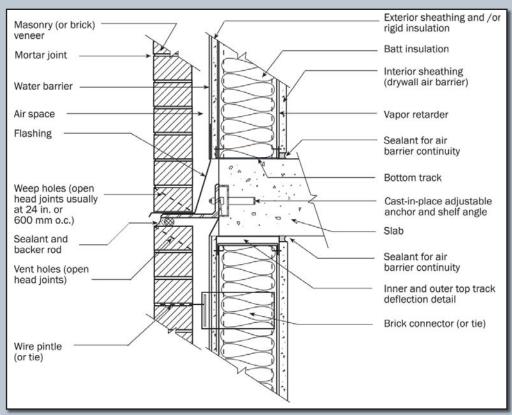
Typical Detail with Drywall Air Barrier in Cold Climate Construction
